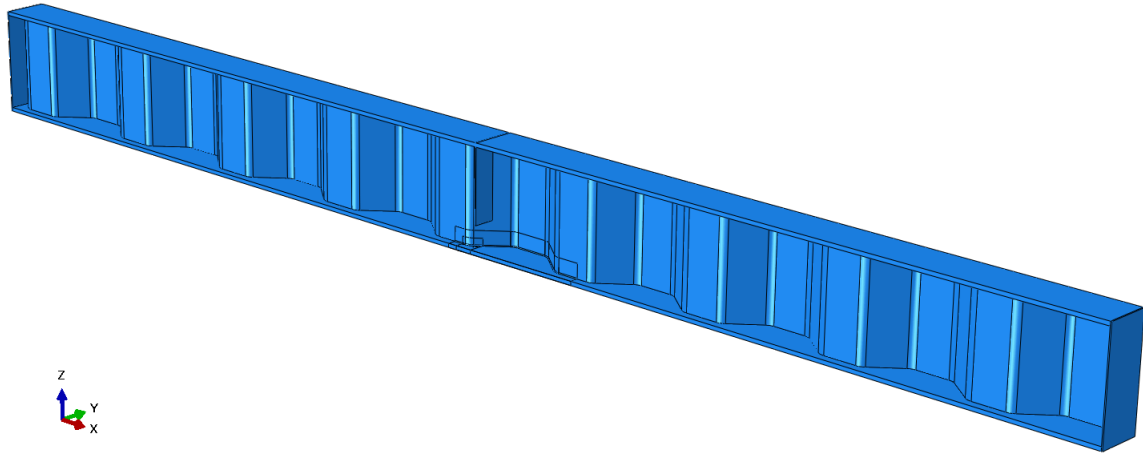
Crack location Kövesdi & Dunai (2014) weld size 3mm.
